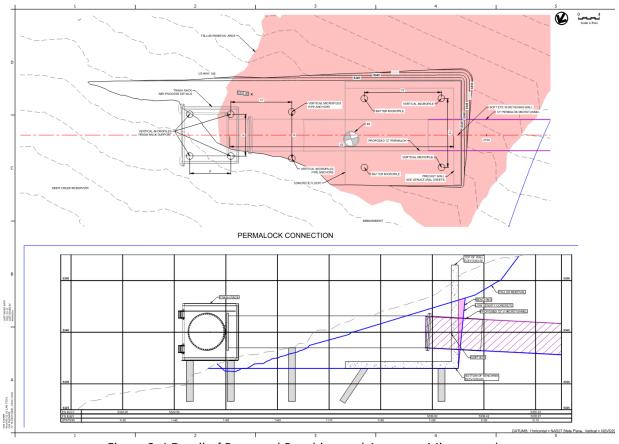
Detail of Proposed Benching and Access to Microtunnel
